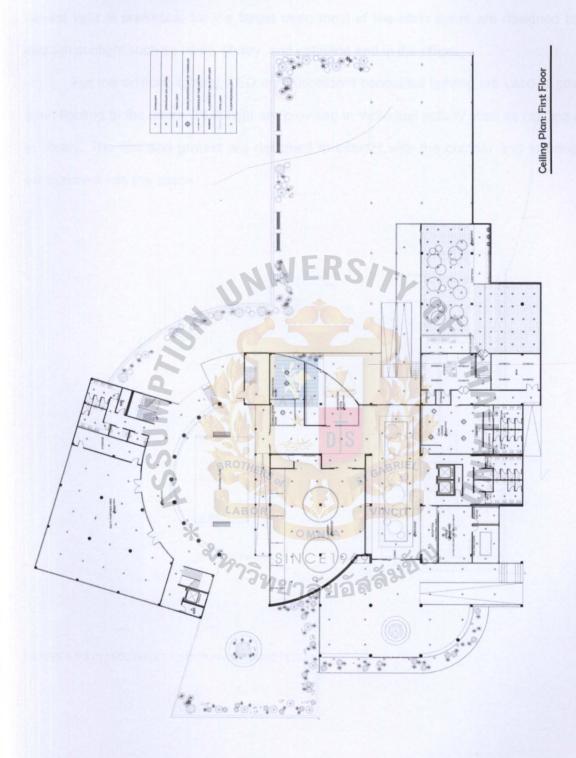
REFLECTED CEILING PLAN: 1<sup>ST</sup> FLOOR
